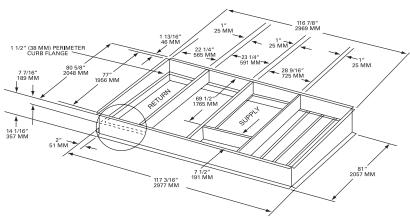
Heat Pump Models - 20 Tons * All dimensions are in inches/millimeters.
